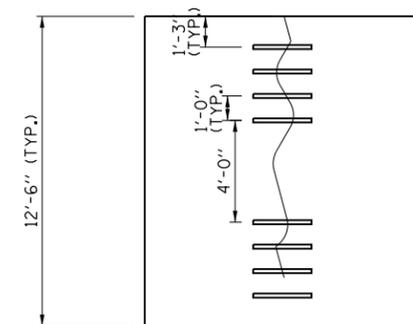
DETAIL C - WIDE MOUTH DOWEL BAR PLACEMENT DETAIL FOR ALL CUSTOM MADE PRECAST PANELS AND OPTIONAL FOR STANDARD SLABS
